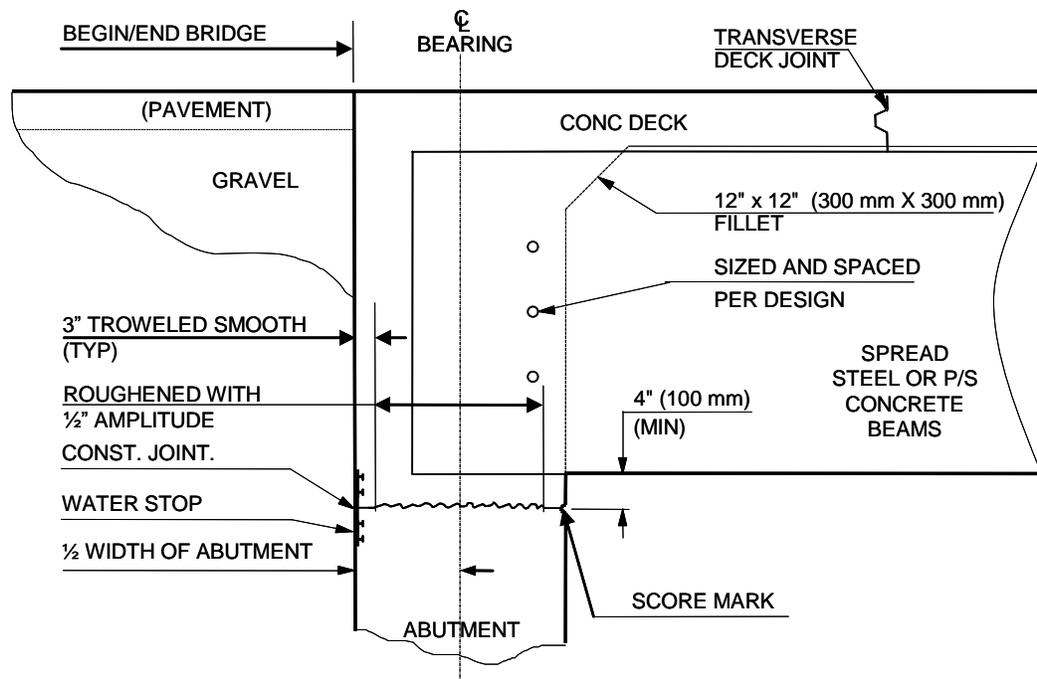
1 Type B - Bridge Ends for Integral Abutment Bridges without Approach Slabs.
